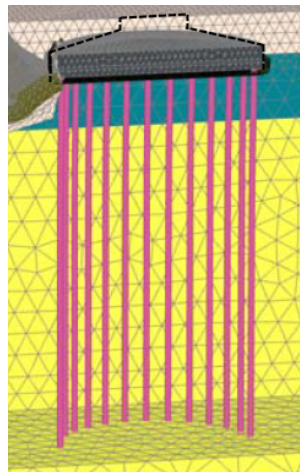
A simplified isometric view of half of a foundation structure including foundation piles but without the turbine tower
